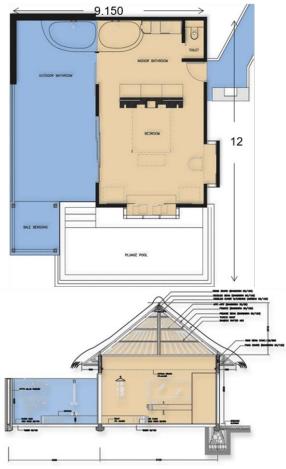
SHOWS THE CHALET PLAN AND SECTION
